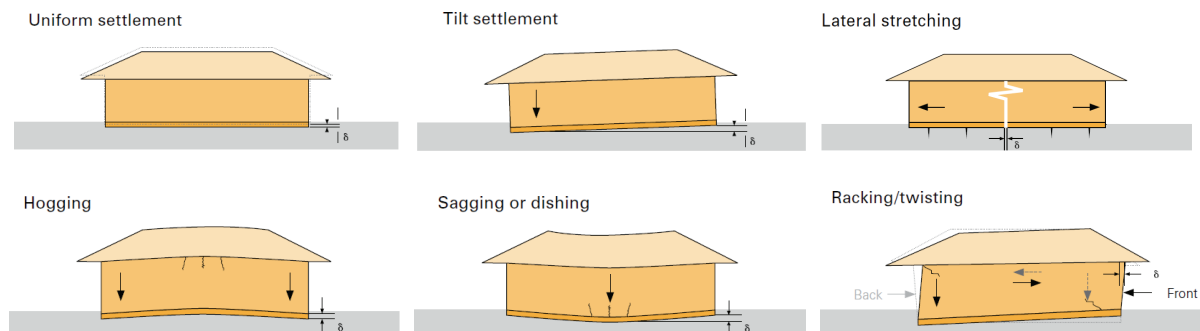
Schematic plot of typical damage patterns for house foundations (DBH, 2011)
